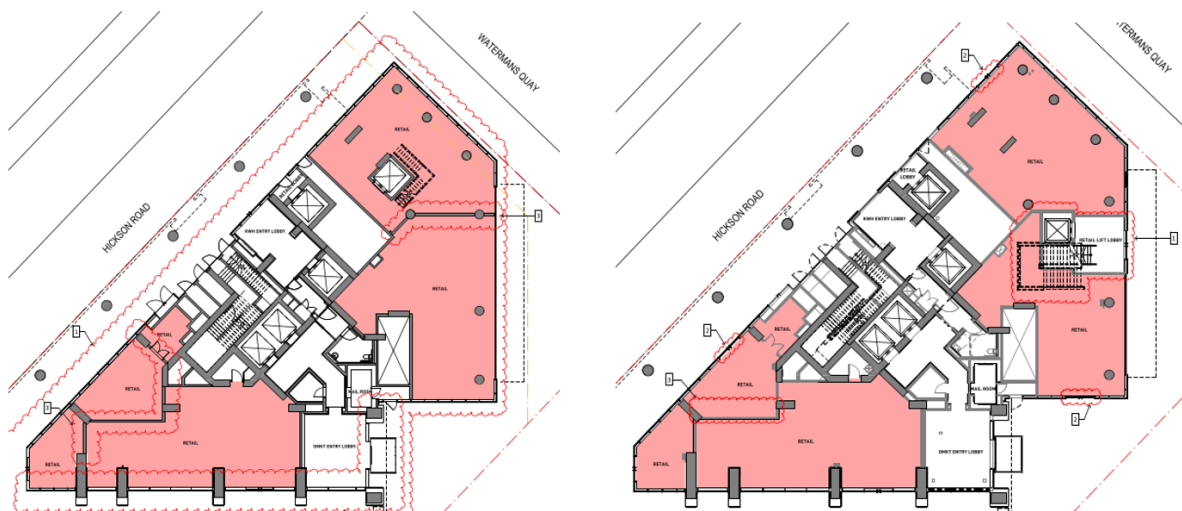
| Approved (left) and proposed (right) ground floor with new retail lift lobby, three new entry/exit doors to retail areas, minor changes to internal separating walls (Source: Applicant response)
